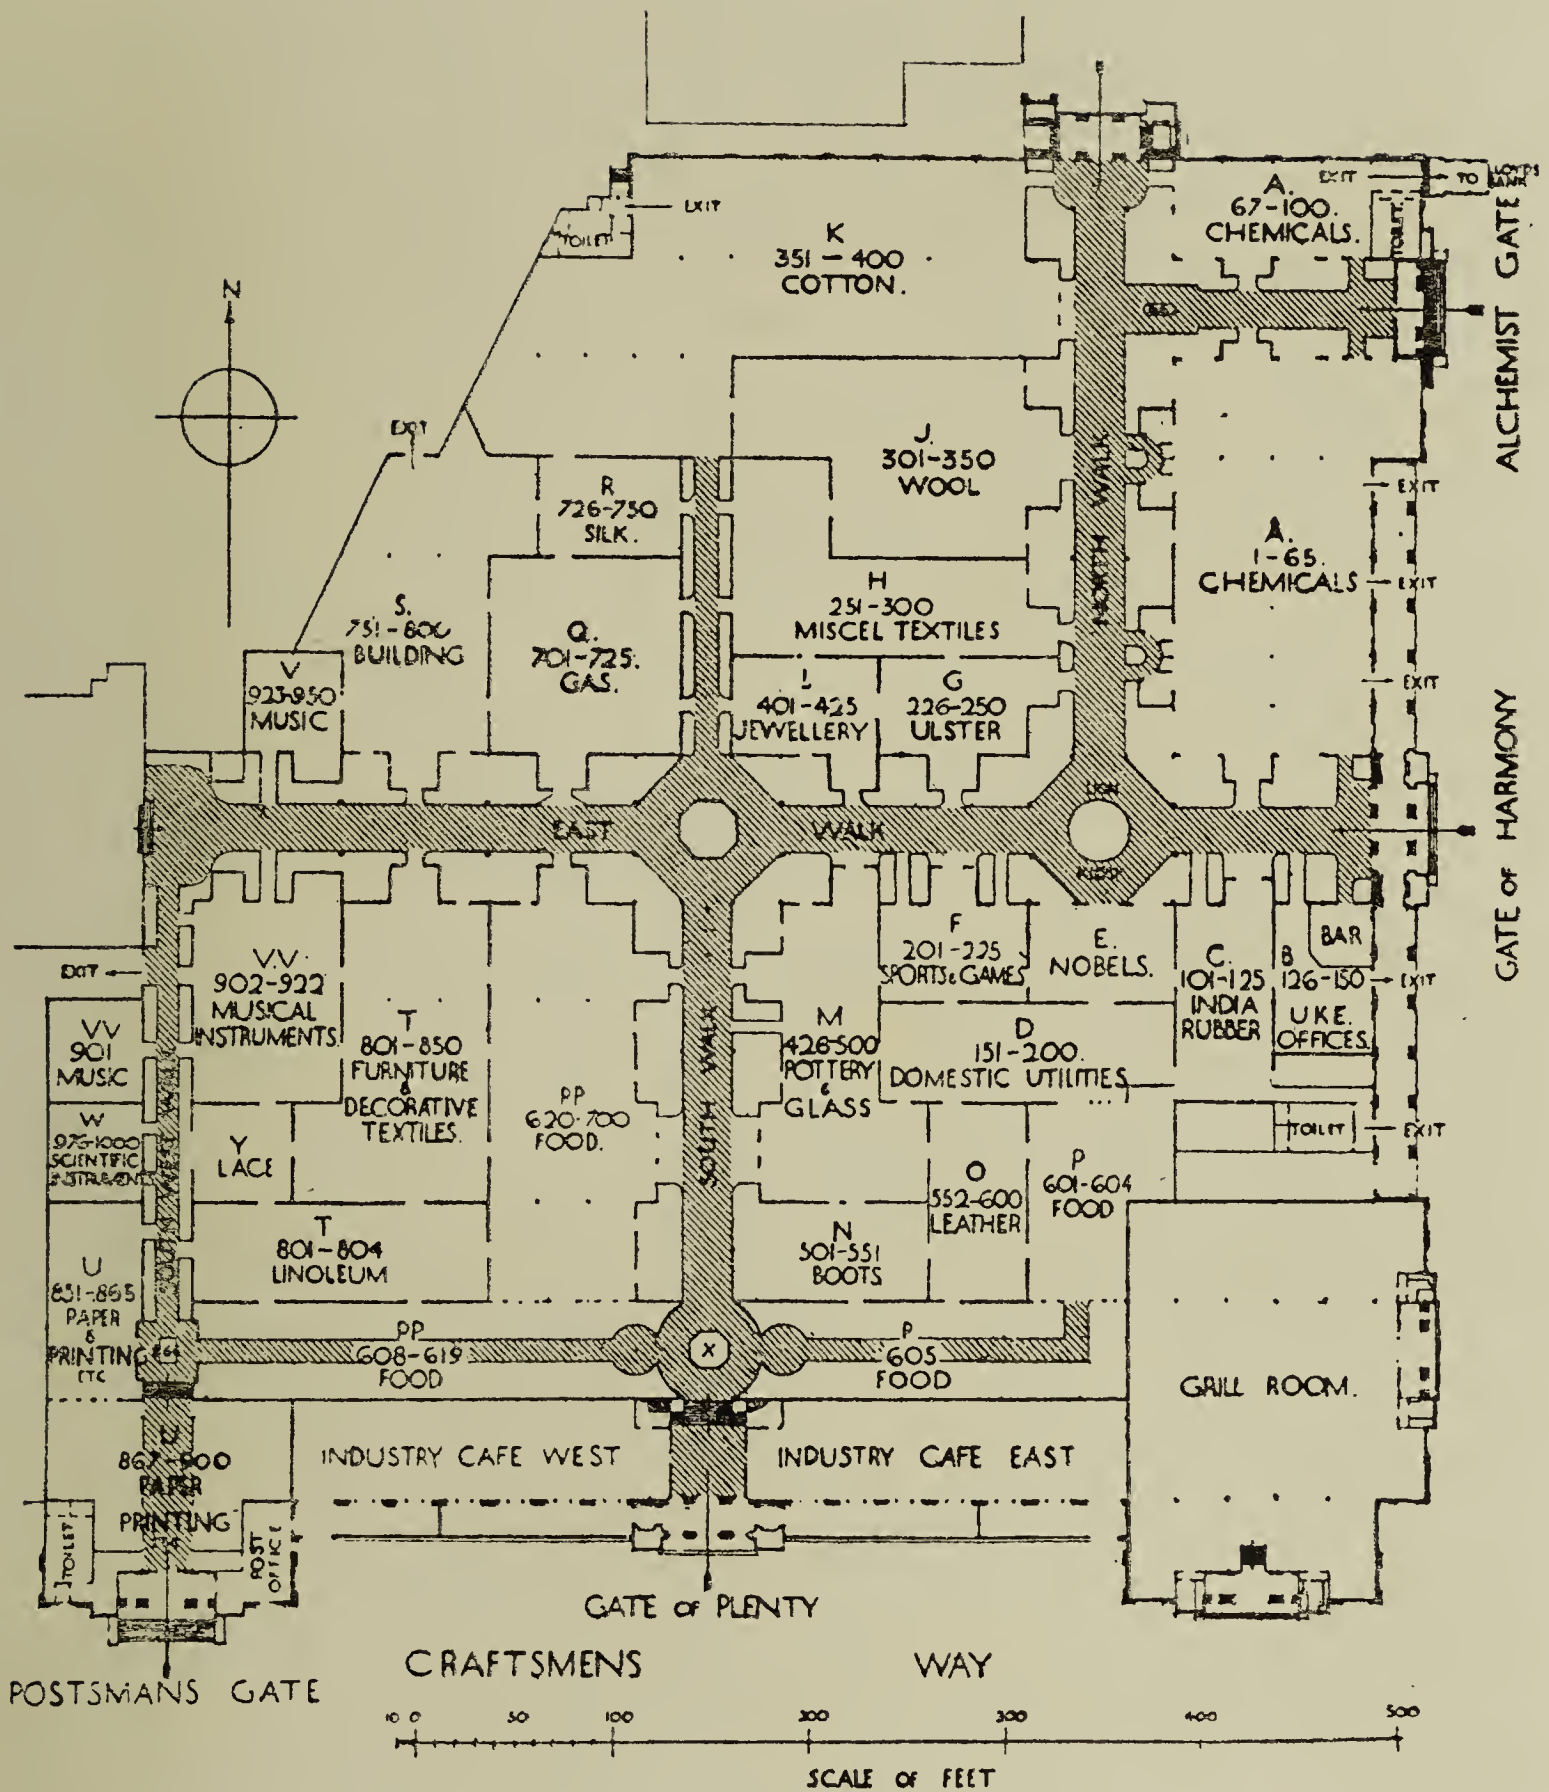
PLAN OF PALACE OF INDUSTRY, WEMBLEY 1924, SHOWING ARRANGEMENT OF SECTIONS.
